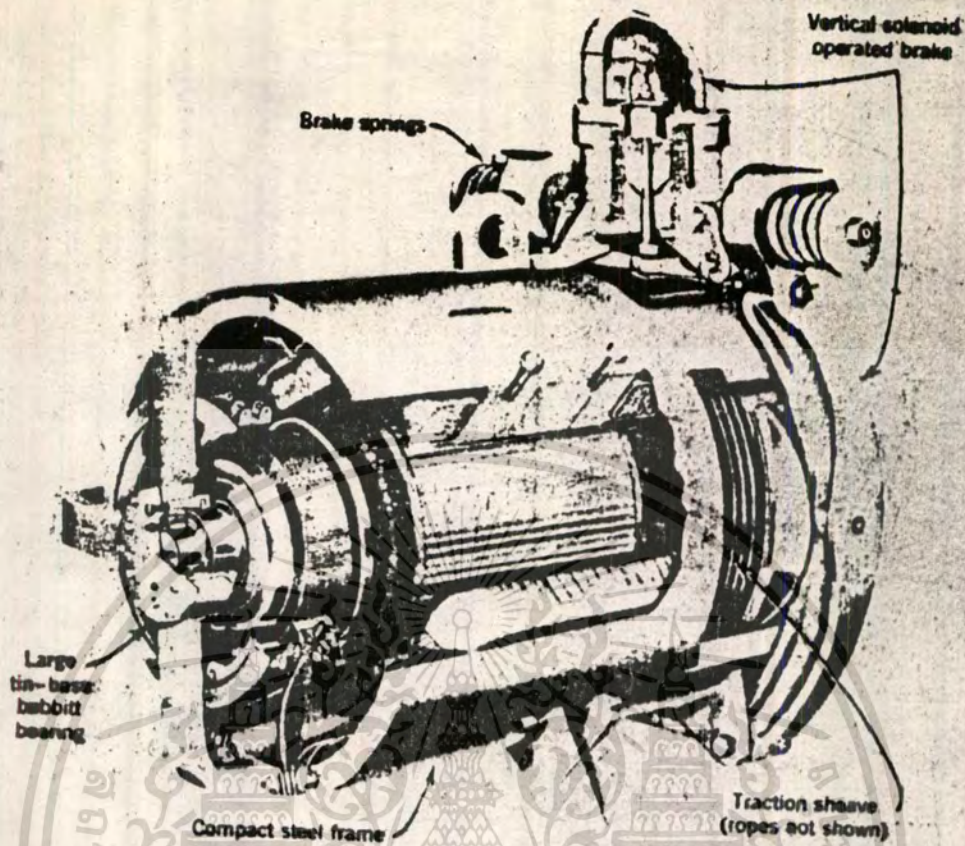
Cutaway view of a typical high speed gearless traction machine. (Westinghouse)
